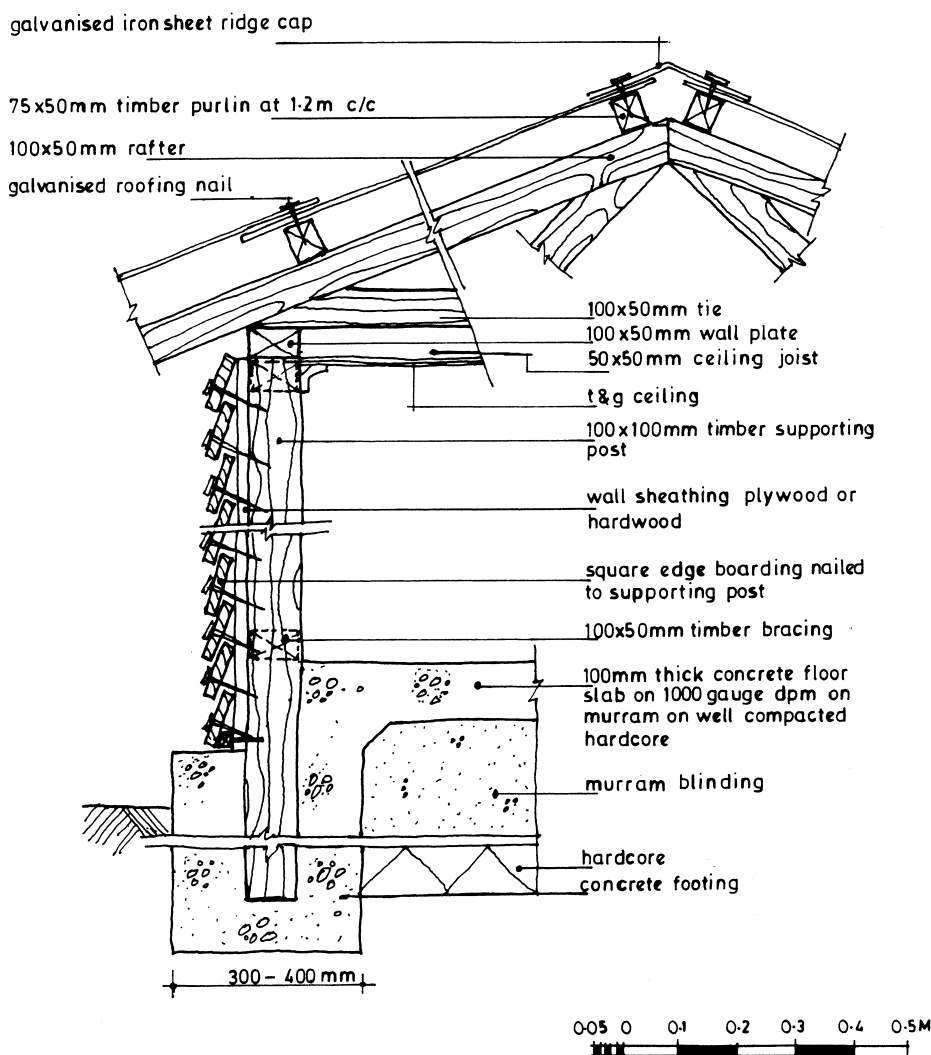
Wall/foundation section of modern house. Source: Rukwaro (1997, p. 182).
